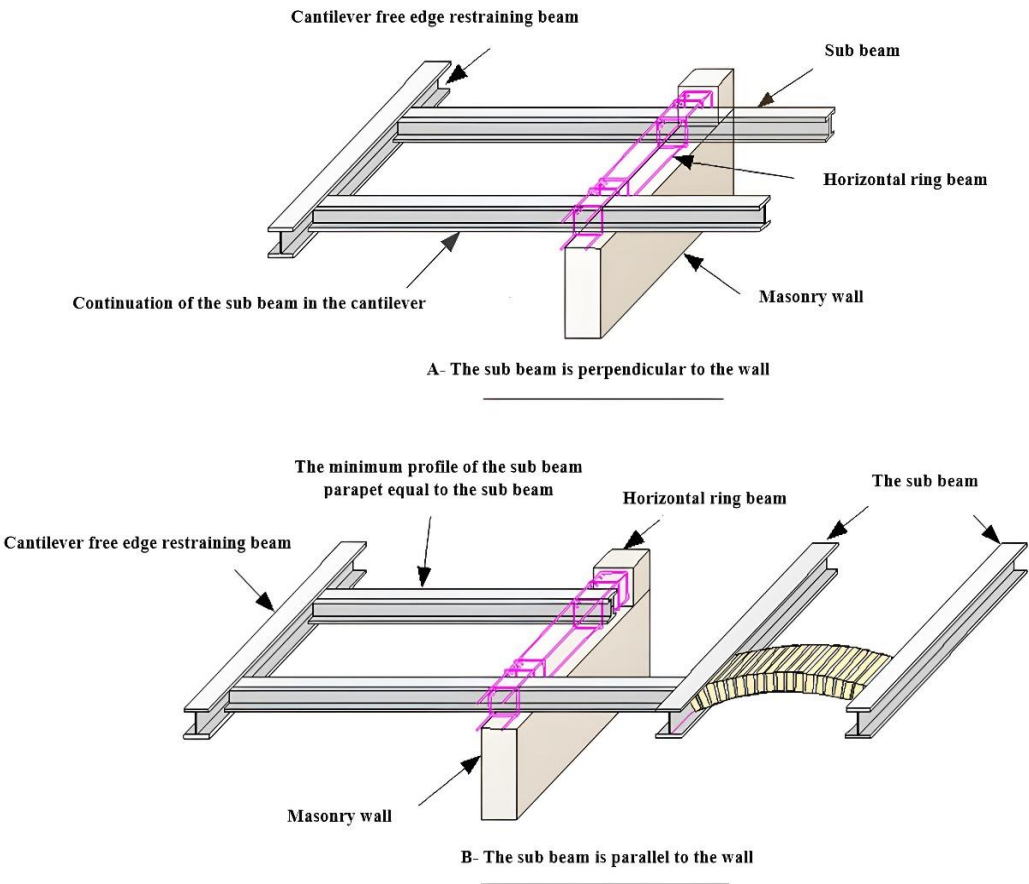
cantilever anchor in the horizontal ring beams of the building based on Iran's 2800 Standard
